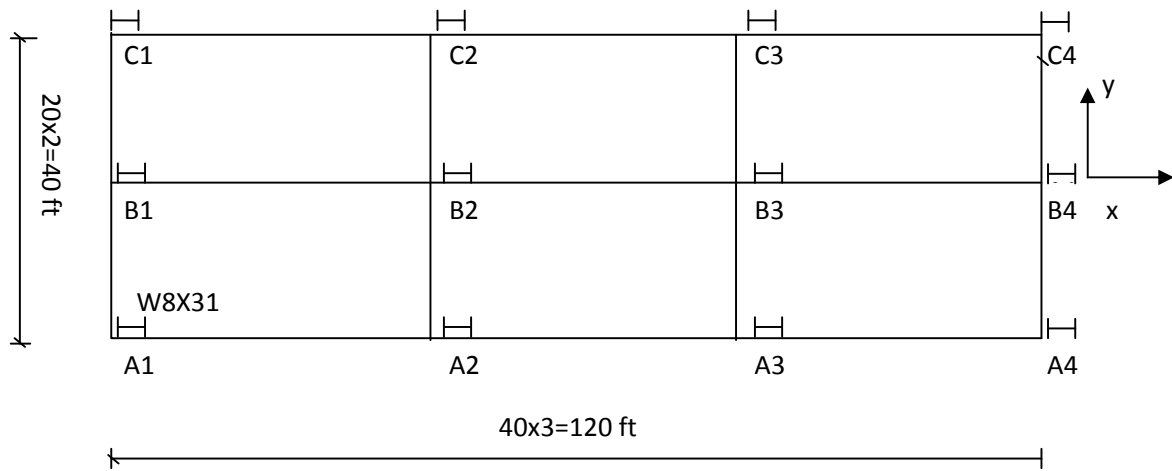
Original Column Orientation and Assigned Column Numbers
